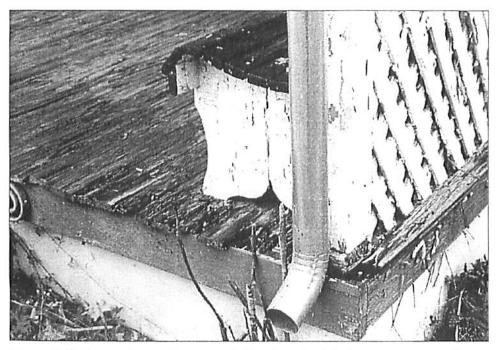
Evidence of water damage to the floorboards of the front entrance porch.
